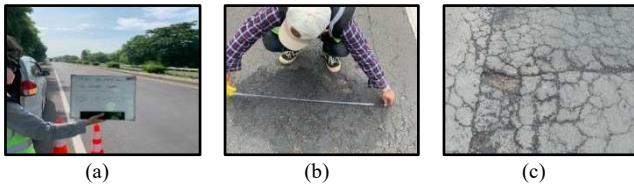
(a) Research area survey, (b) Road damage length, (c) Road damage
